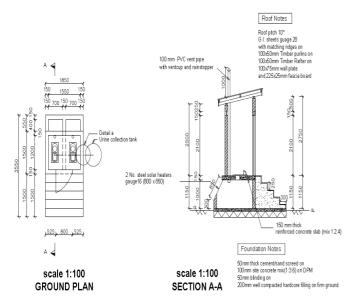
Drawing of a UDDT (source: WSDF-SW).
